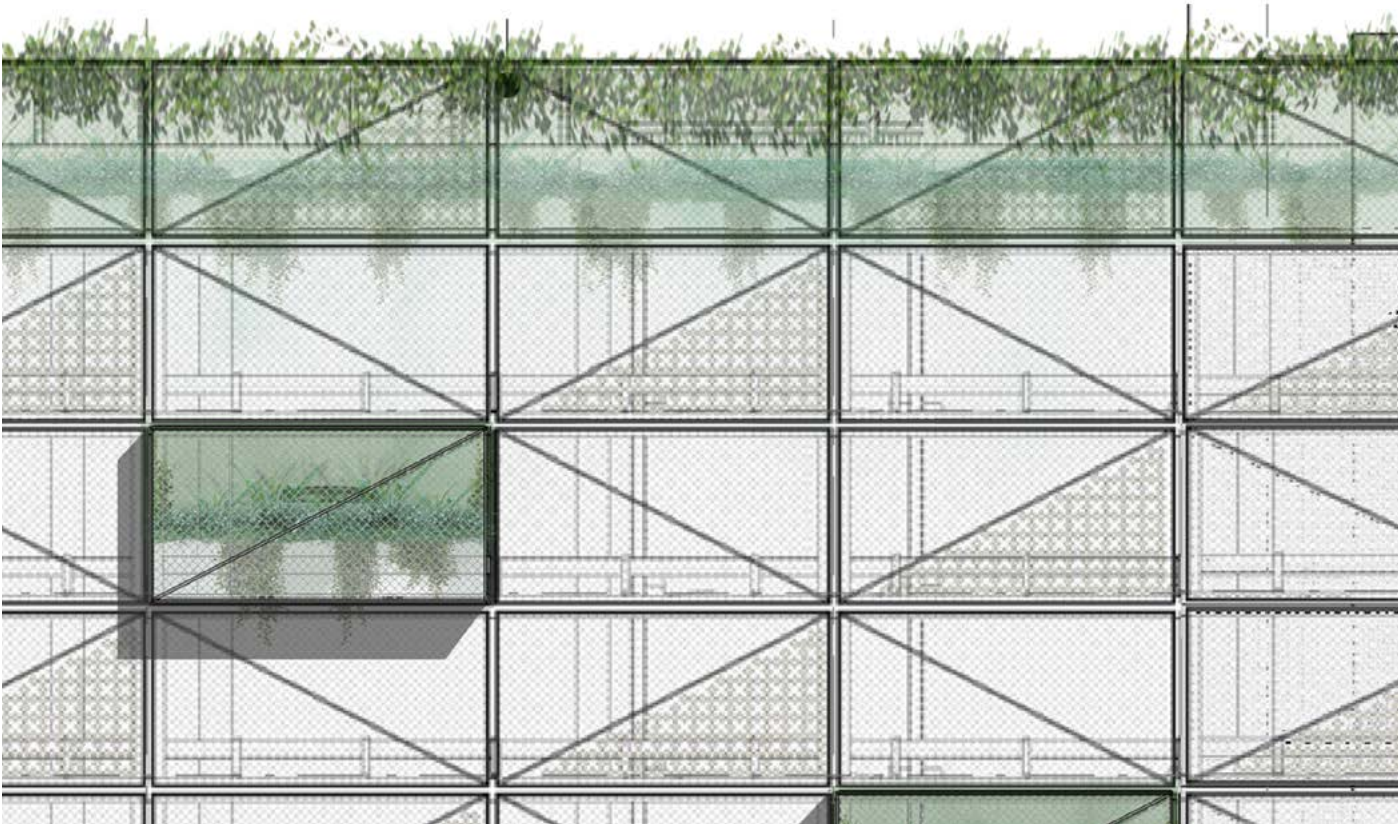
Proposed Multi Level Carpark Facade Planter Detail
